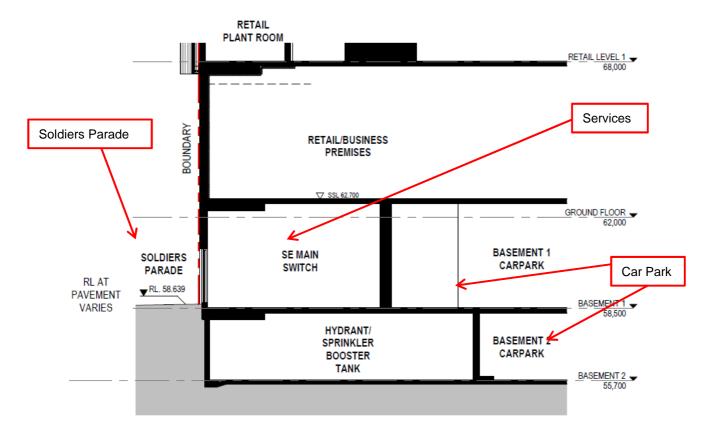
Cross Section of SE Main Switch room and Soldiers Parade in the SE quardant.
